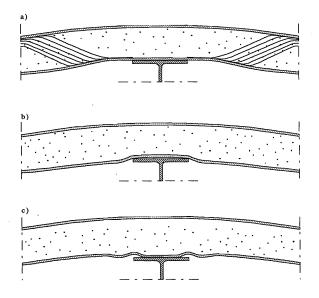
Failure modes of continuous sandwich panels at intermediate supports; a) shear failure, b) core crushing failure and c) face bending and buckling failure.
